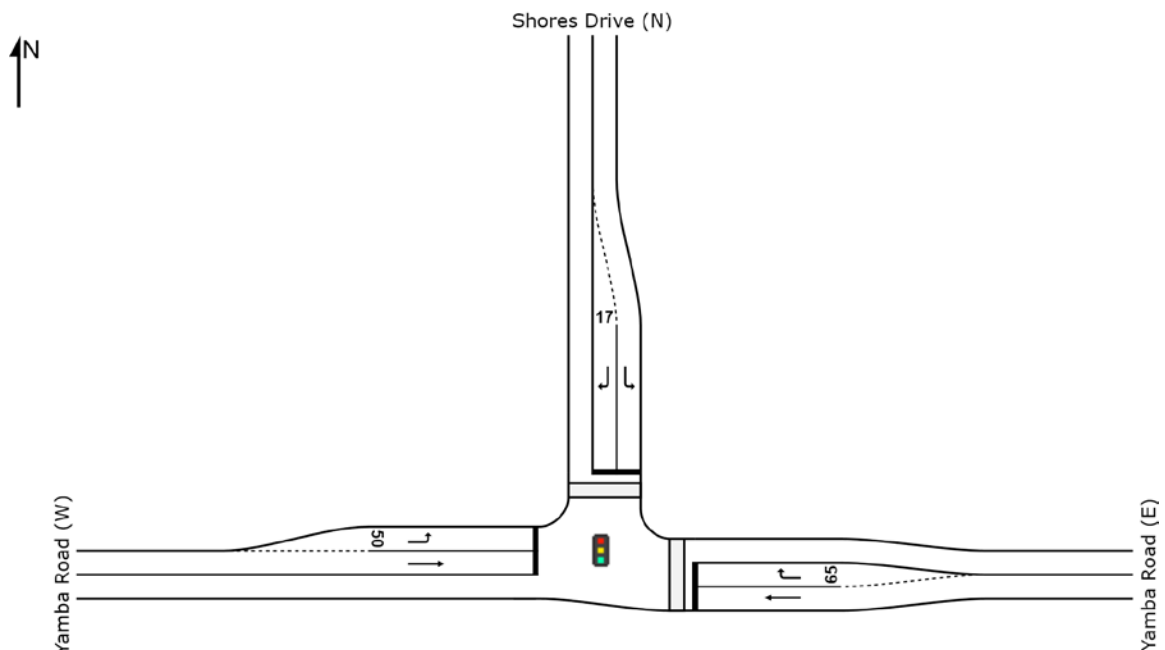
Shores Drive / Yamba Road Intersection – Proposed Signalised Upgrade
